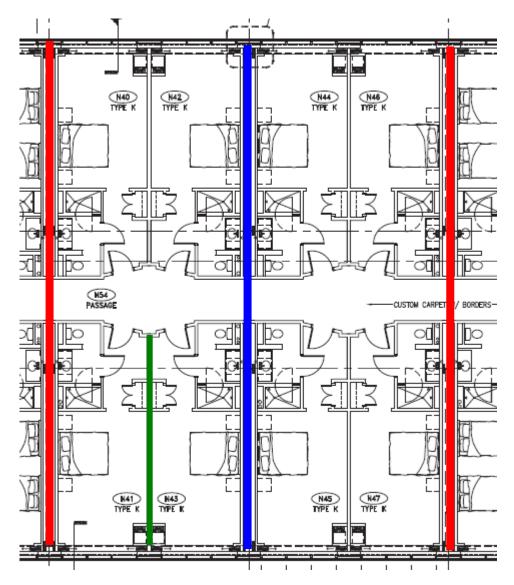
Typical Bay 4th - 11th floor Drawings Courtesy of JCJ Architecture
